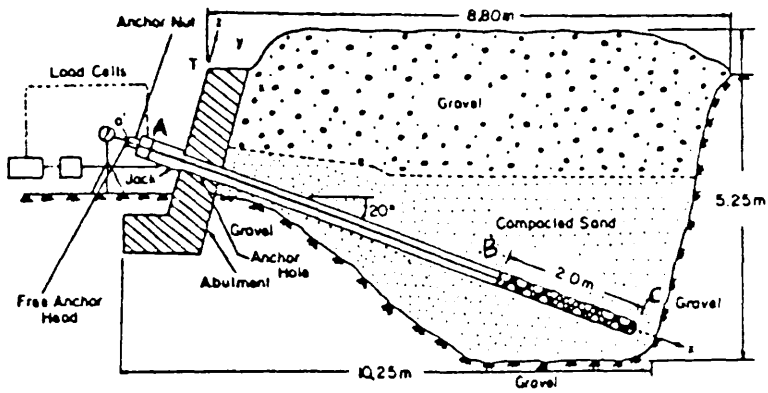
Elevation of anchor-rod system, Desai et al 1986.
